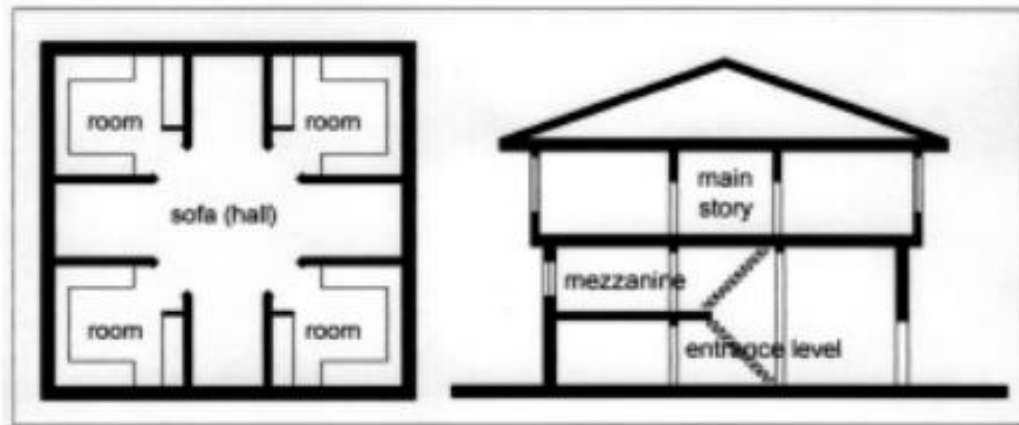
Plan and section cut of Typical Turkish house of the late 19th century (Asatekin, 1994)
